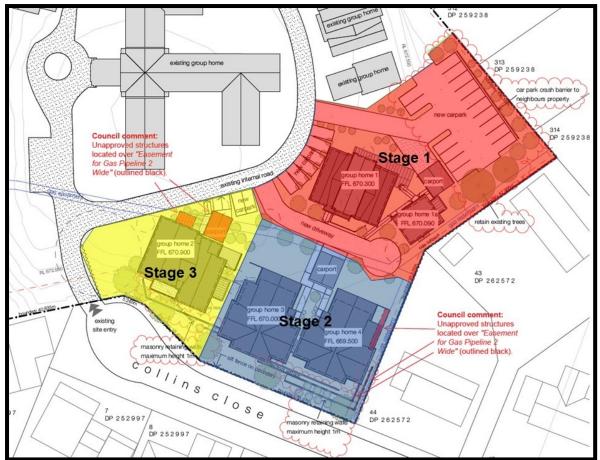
Construction Staging Plan Overlaid on Site Plan Approved under Development Consent No. 2019/352.
